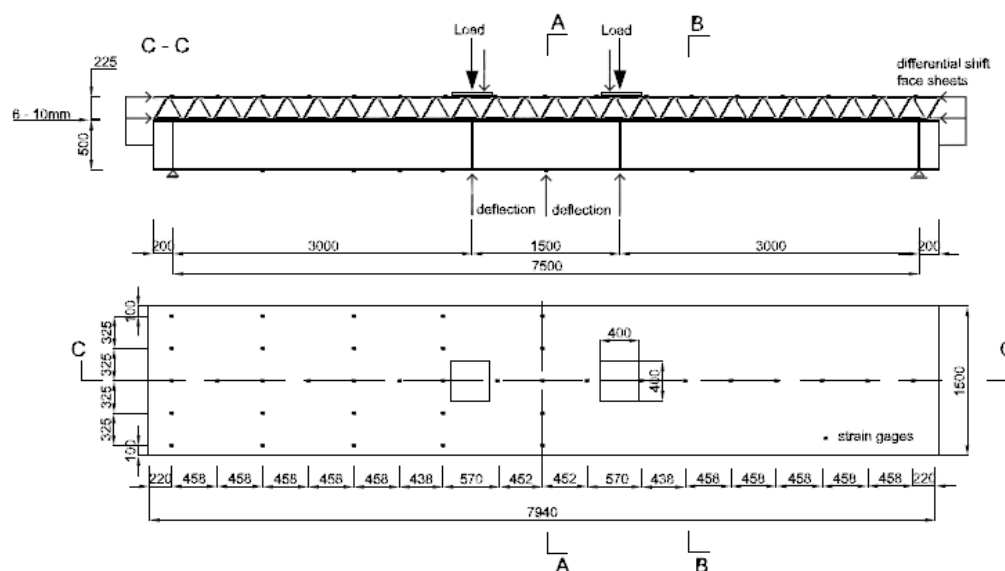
Test set-up of adhesively bonded hybrid FRP-steel girders(Keller & Gürtler, 2006)
